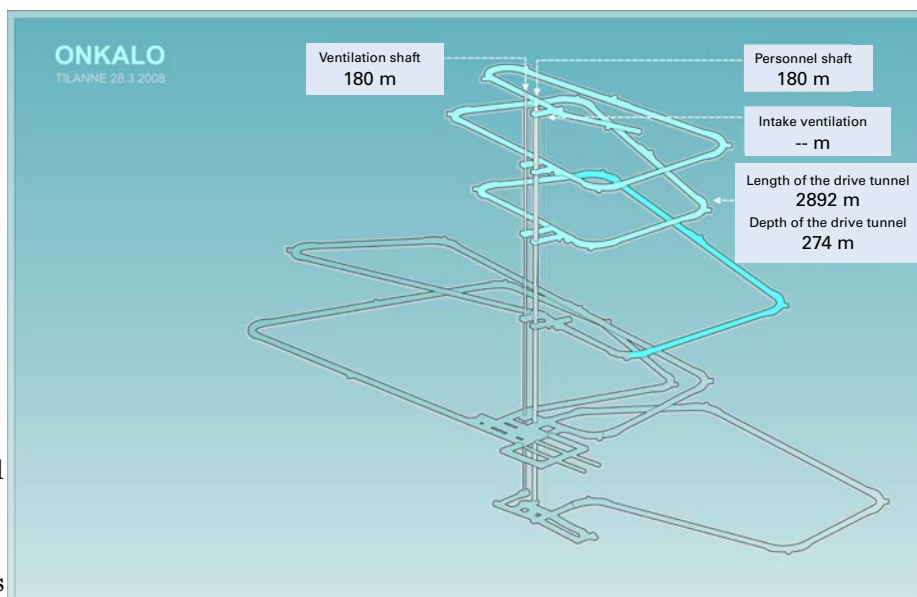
Plan of the underground rock characterisation facility (Onkalo) and status of the construction on 28 March 2008.
